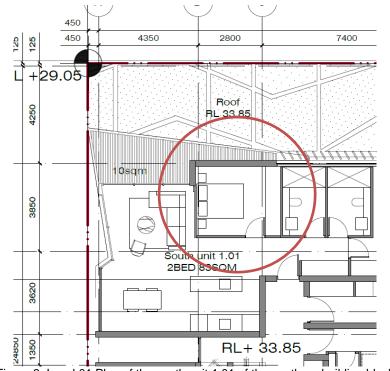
Level 01 Plan of the south unit 1.01 of the southern building block
